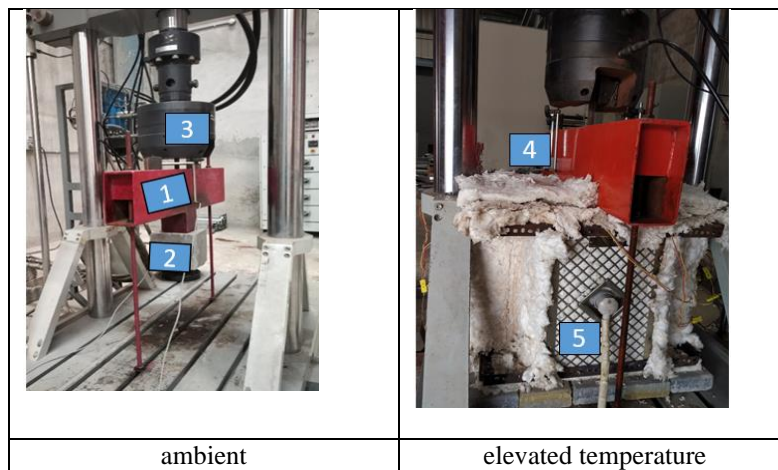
Test set up (1 - beam resisting against the pullout specimen, 2 – Specimen, 3 – Loading actuator, 4 – LVDT, 5 – electric heating panel)
